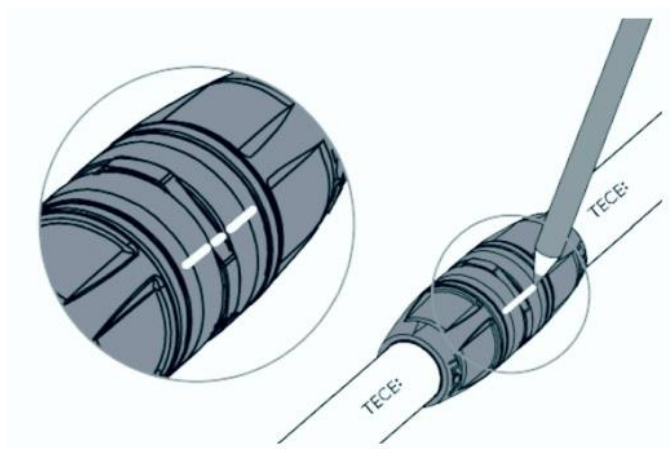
Mark clearly the place of installation of the screwed bush
